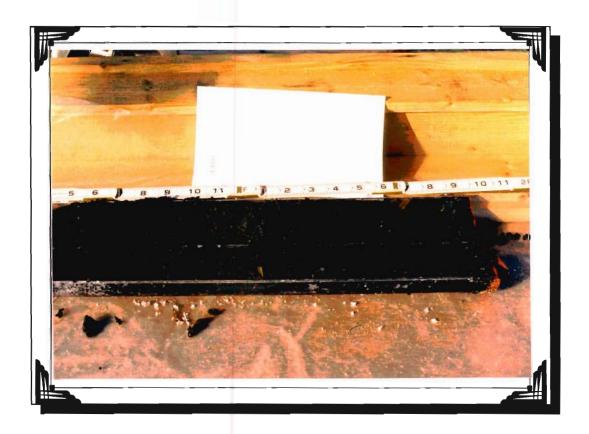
Core sample A-7. Dark organic zones encountered throughout core.
